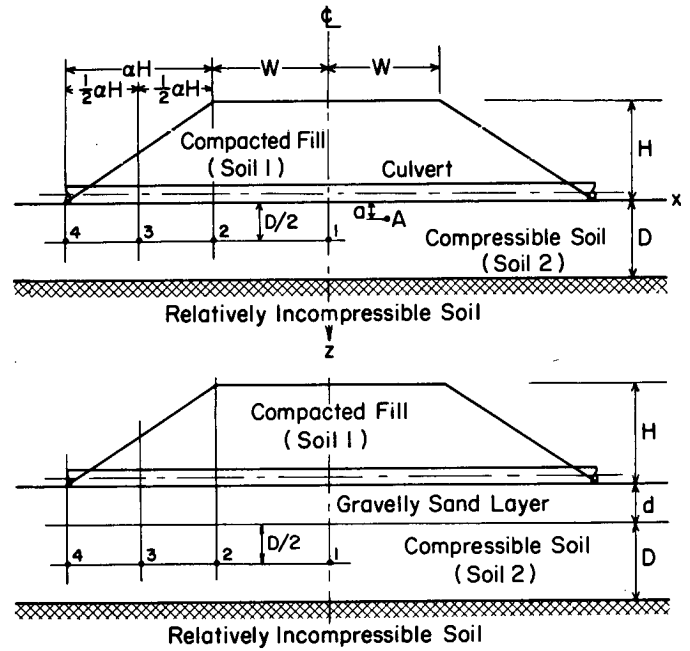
Typical cross sections of compacted embankment and underlying soils.
